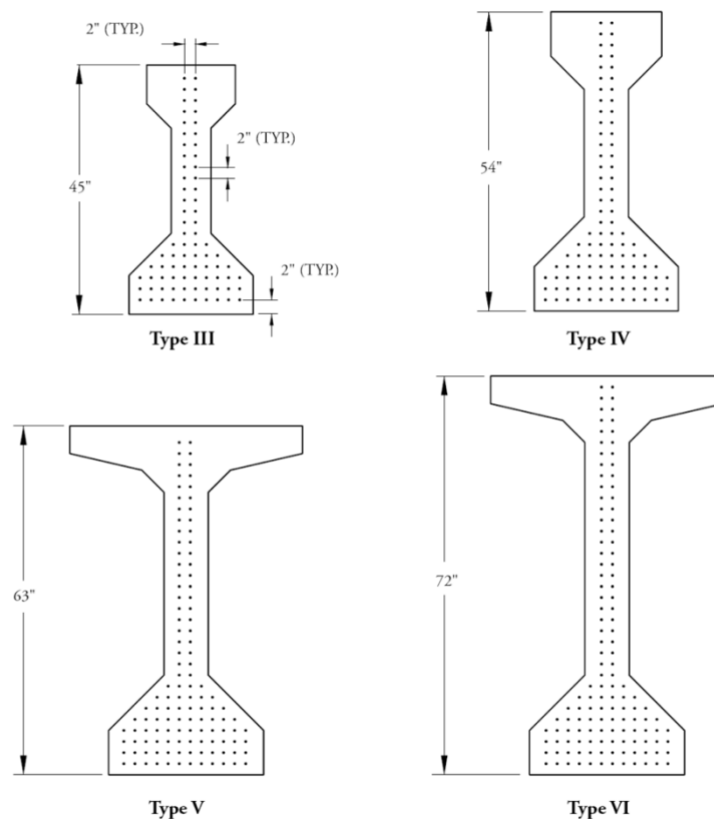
AASHTO I-Beam Cross Sections and Permissible Strand Locations. Accessed from Precast/Prestressed Concrete Institute (2023)
